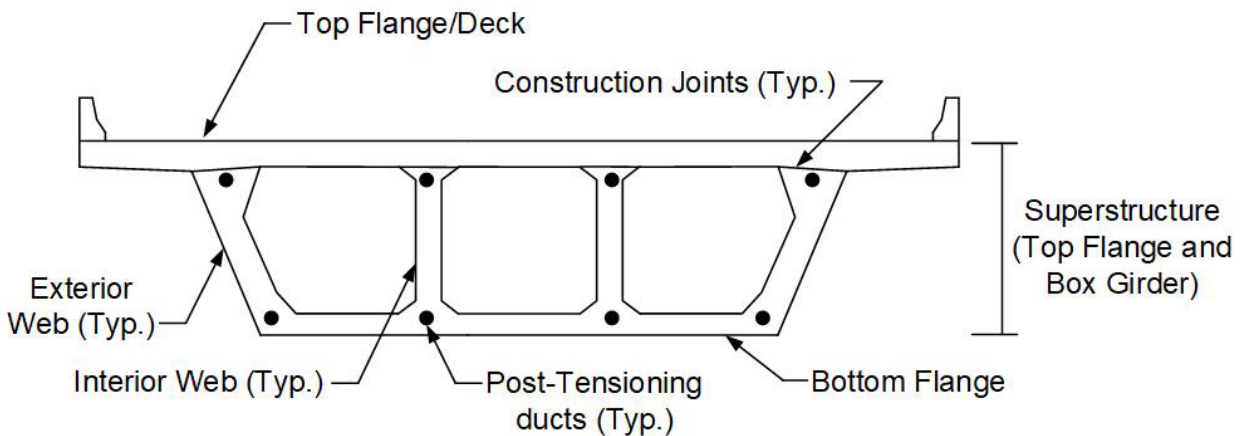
Replaceable Deck of a Multiple Cell Cast-in-place Box Girder
